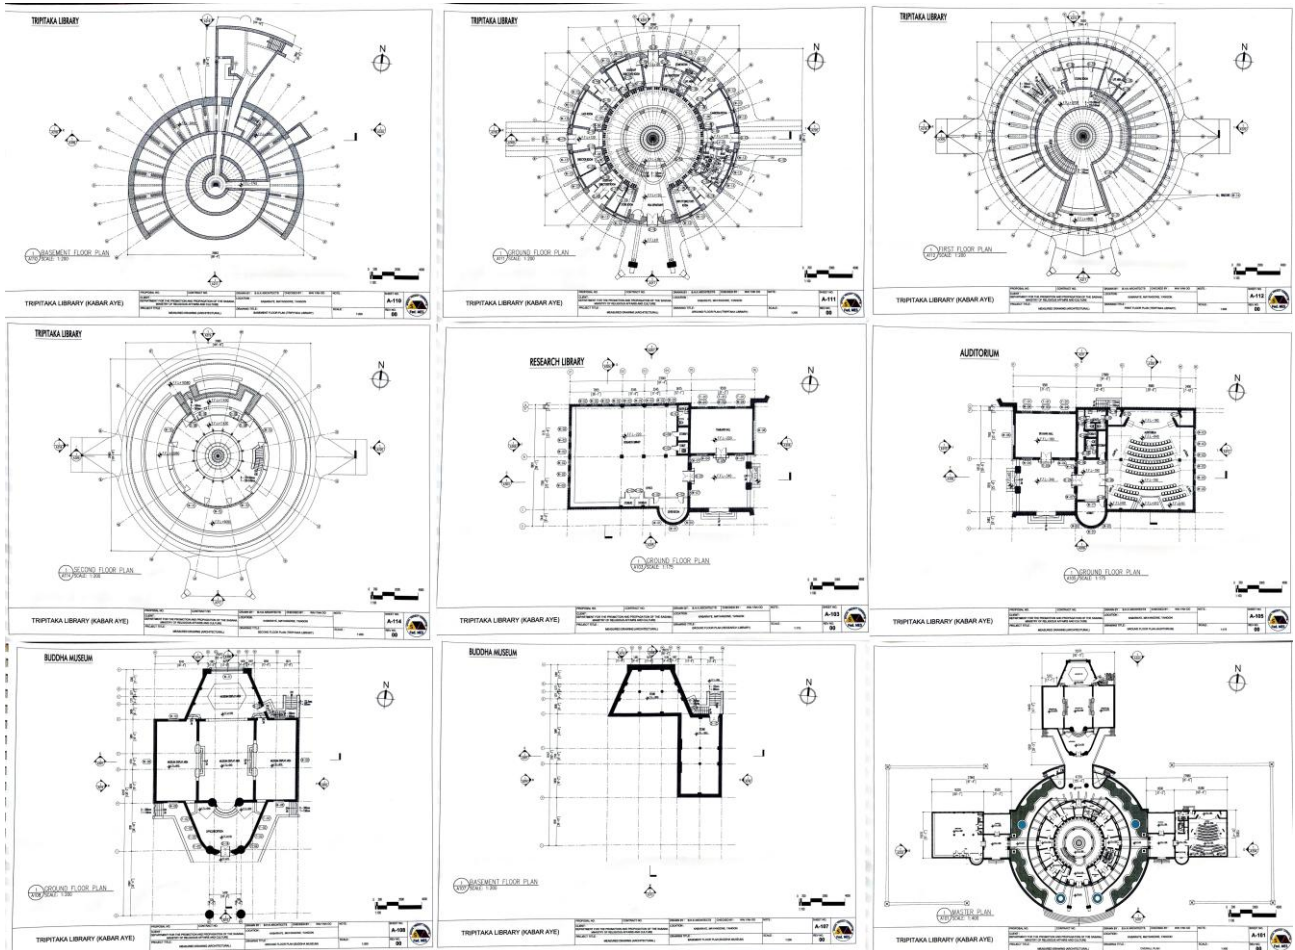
Floor plans of the Tripitaka library left to right; 1st row :basement floor plan, ground floor plan, 1st floor plan of the main library core, 2nd row: 2nd floor plan of the main library core, Research library Wing ground floor plan, Auditorium Wing ground floor plan, 3rd row: Buddha Museum Wing's ground floor plan and 1st floor plan, Overall of Tripitaka Library's ground floor plan (source: Department for the promotion and propagation of the Sasana, Ministry of Religion Affairs and Culture).
